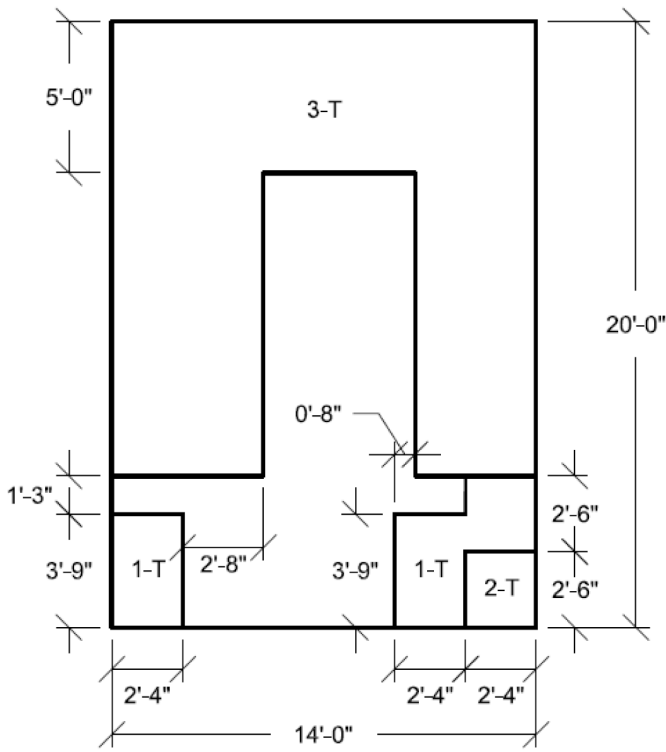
H.6-180B DGFOV Wall 10 Looking From Outside Transverse Reinforcement Zones
